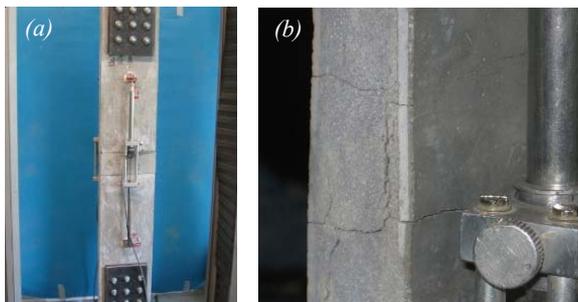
Test set-up for the tensile tests (a); and concrete splitting under pure tension along reinforcement (b) [9]
